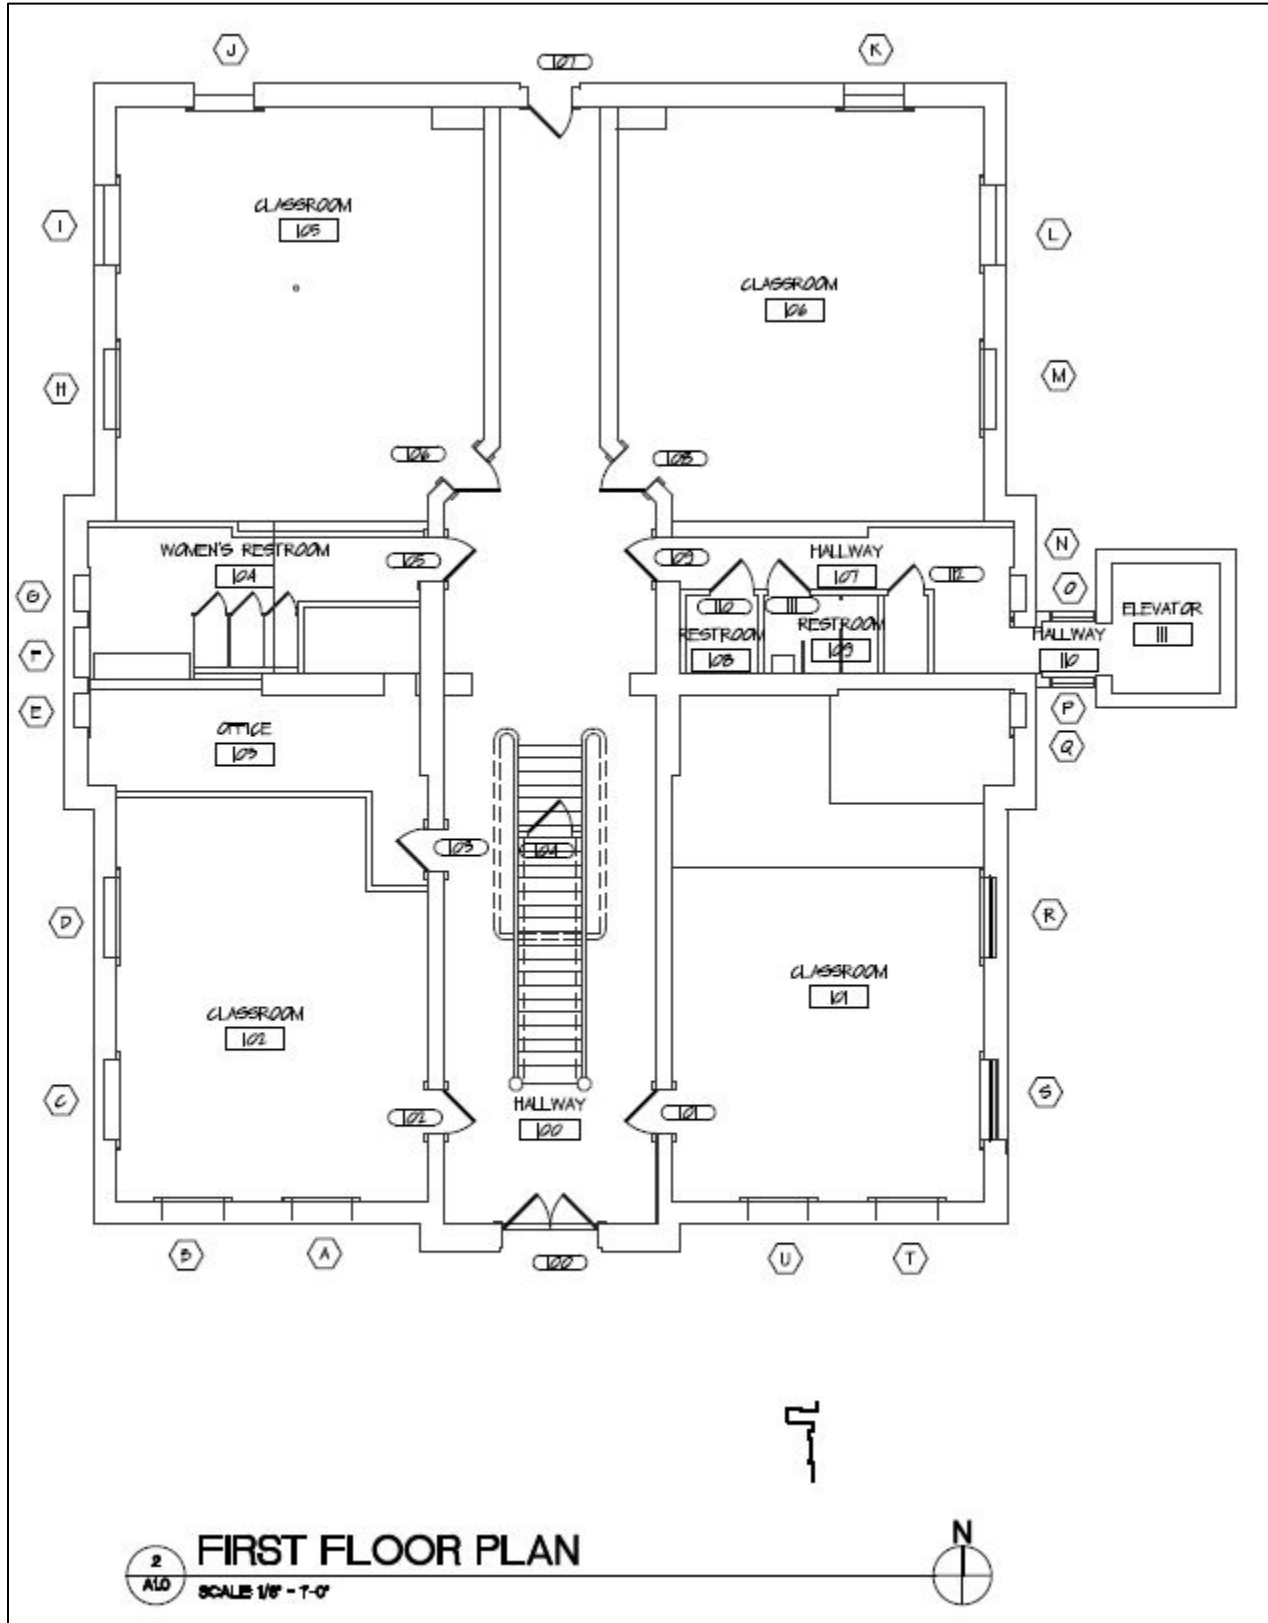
Courthouse, First Story Floorplan, Scheuber + Darden, *Courthouse Historic Structure Assessment* (2018).
